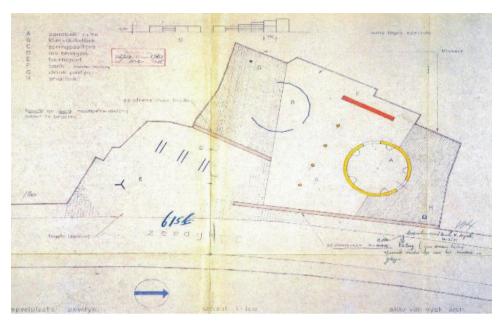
Playground, Zeedijk, Amsterdam, 1956.
